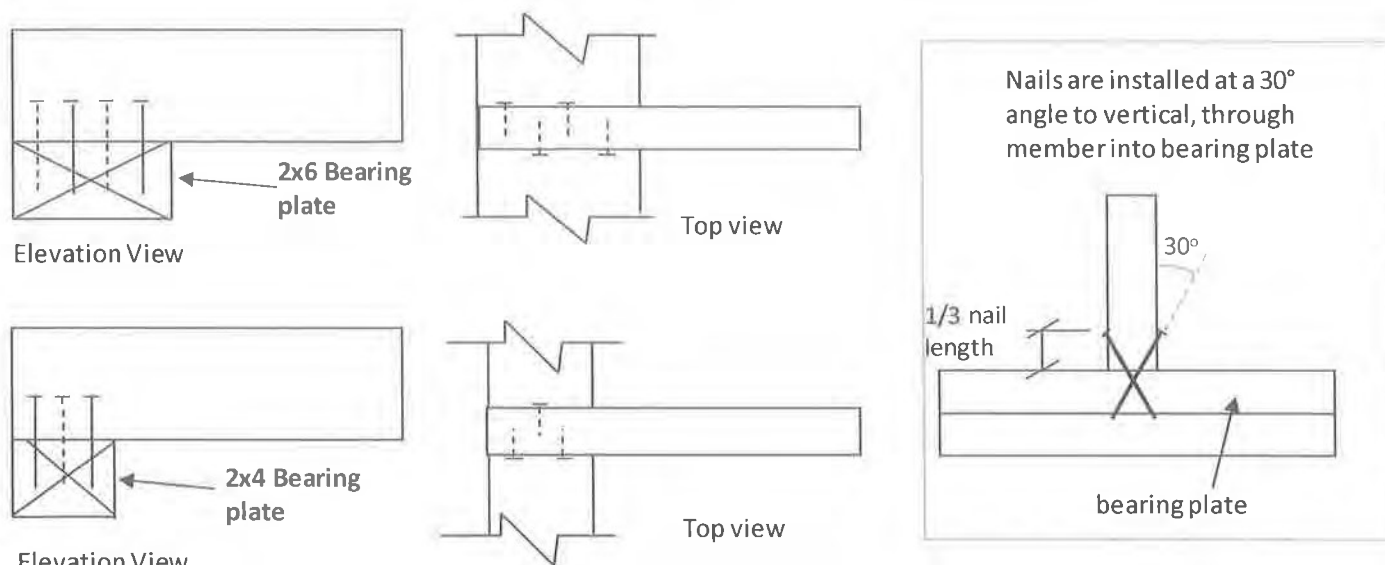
Toe-Nailing Rafter / Ceiling Member to Girder Truss
